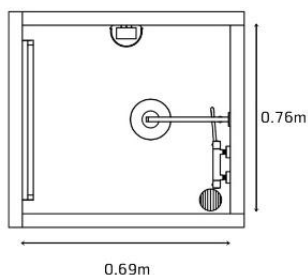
Layout in above view shows public bath room and size of reservoir.
